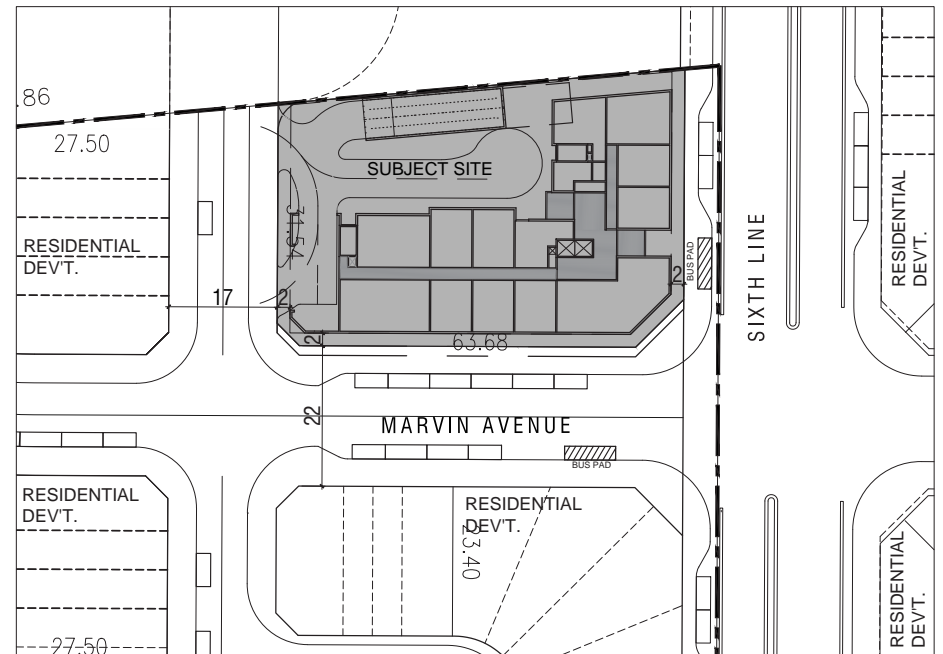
Proposed Mixed-Use Building Site Plan (source: Q4 Architects)
